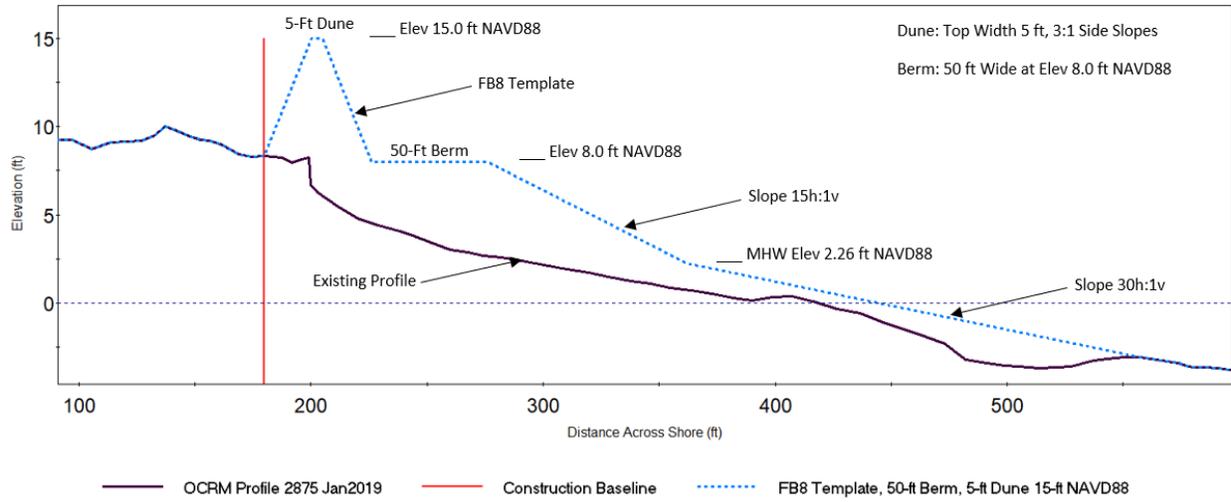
Typical Profile Northeast Segment Folly Beach
